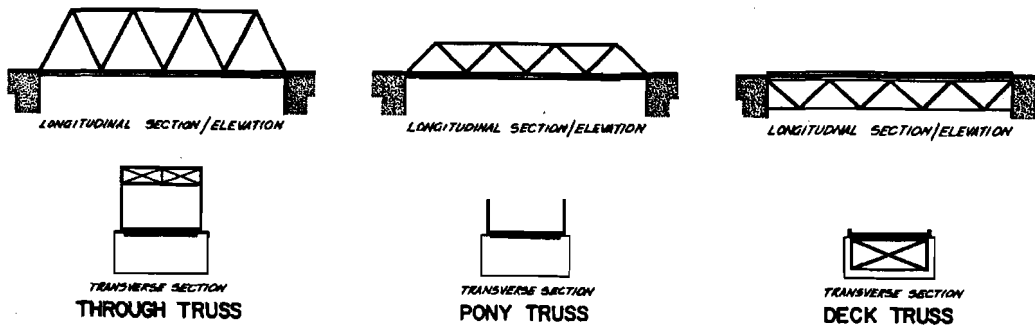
Through, Pony, and Deck Trusses. *Courtesy of Historic American Engineering Record.
